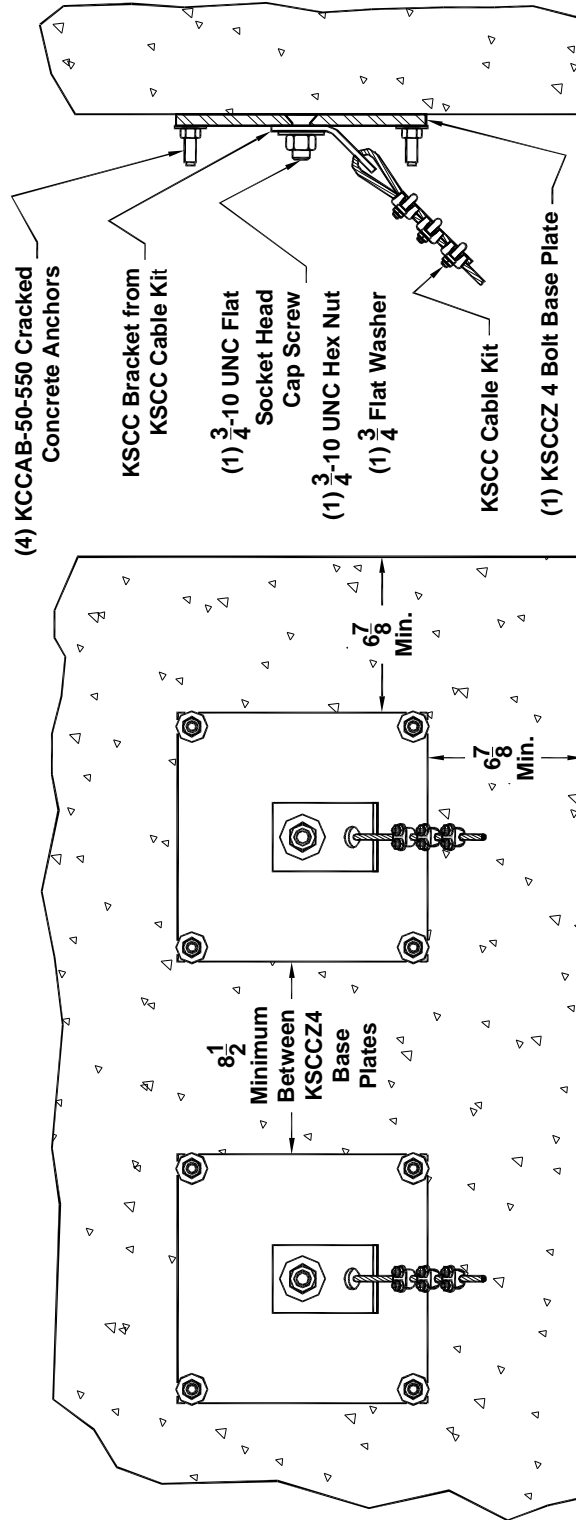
; Model KSCCZ4 Attachment Kit to Concrete Plates Using the KSCC Brackets – (4) 1/2 Anchors
